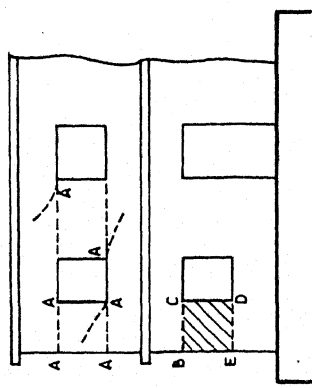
POSITION OF CRACKS IN A BRICK BUILDING
